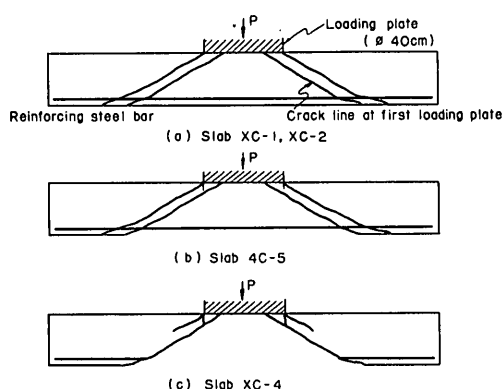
Type of Shear Failure at Additional Loading Test
